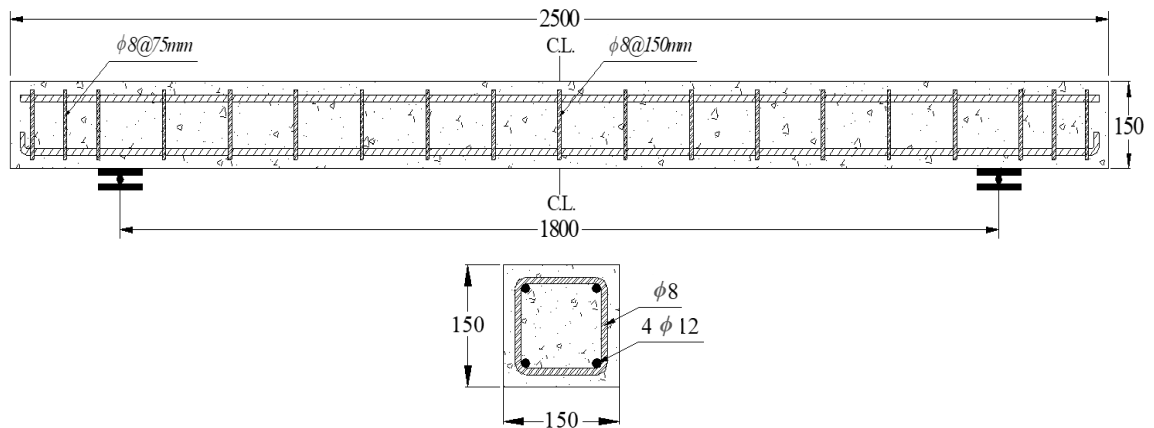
Dimensions and steel reinforcement details of the specimens (all dimensions are in mm).
